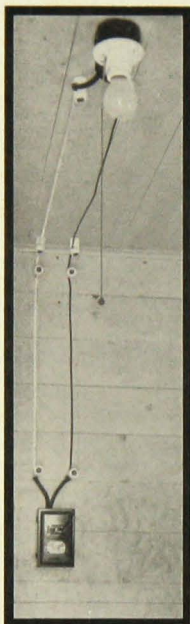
KNOB AND TUBE WIRING IN A MILK HOUSE
